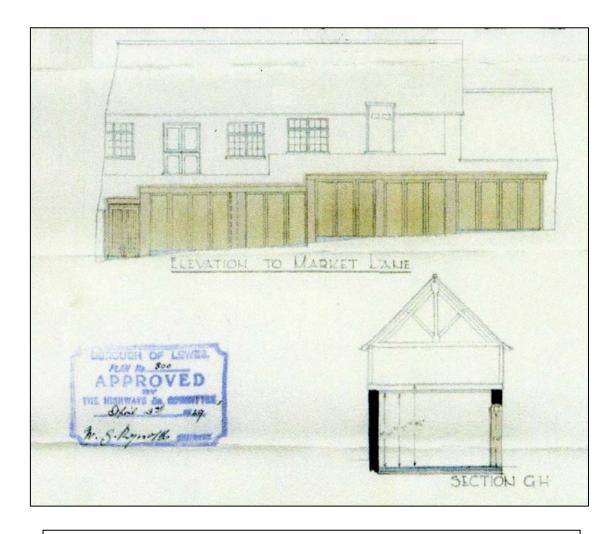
190 High Street, Lewes: 1929 Elevation & Section of outbuilding (Adapted from Stainsby Architect Report)
